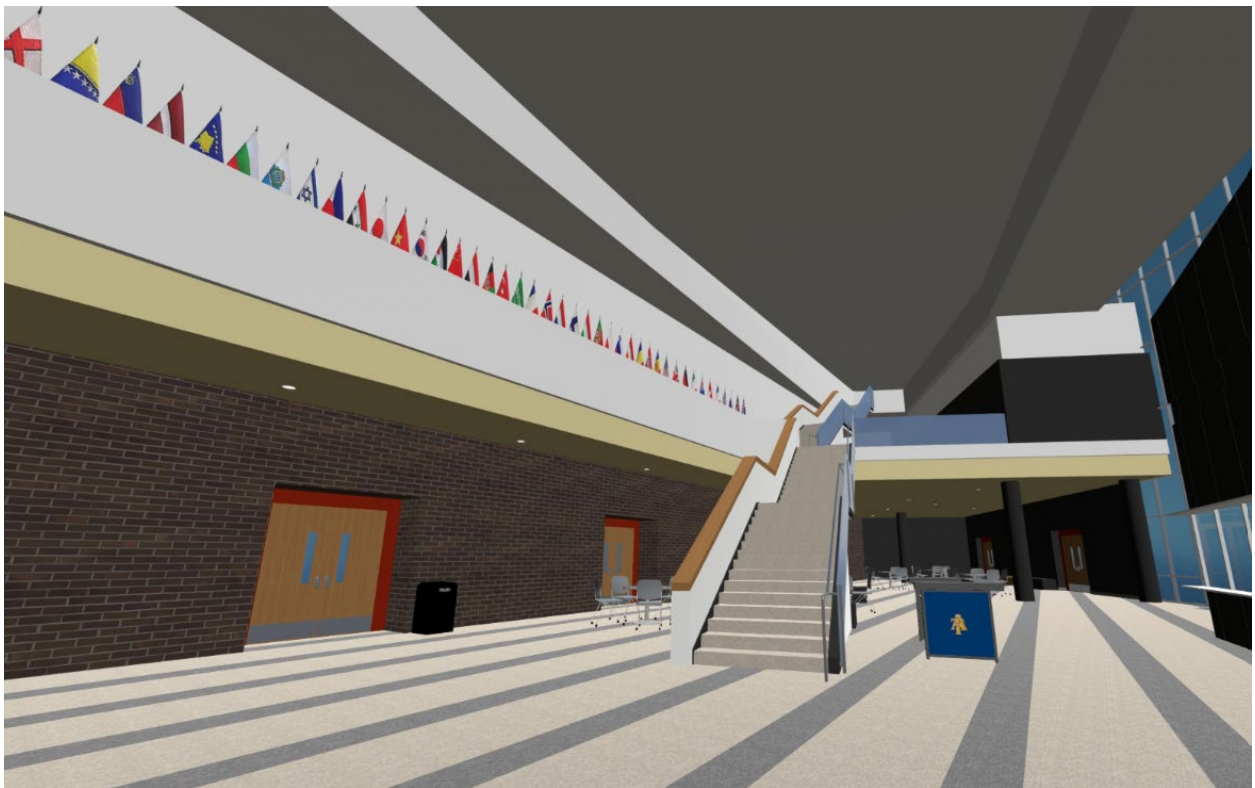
Detailed internal structure of a building, highlighting precise planning.
